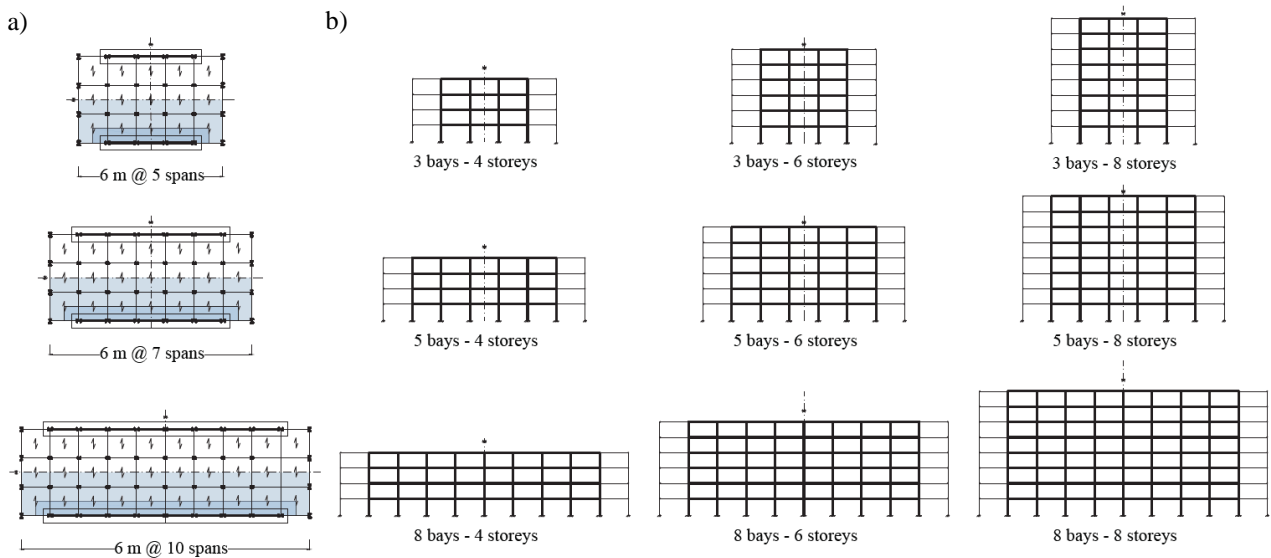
Case-study buildings: (a) Plan views; (b) Elevation views.
